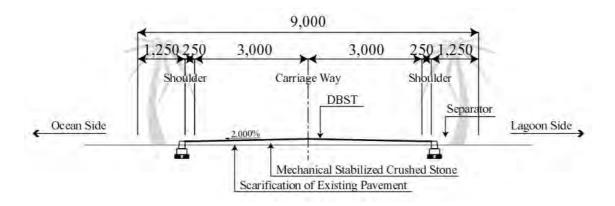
Standard Cross-Section: South Tarawa Road in Bairiki (1)
